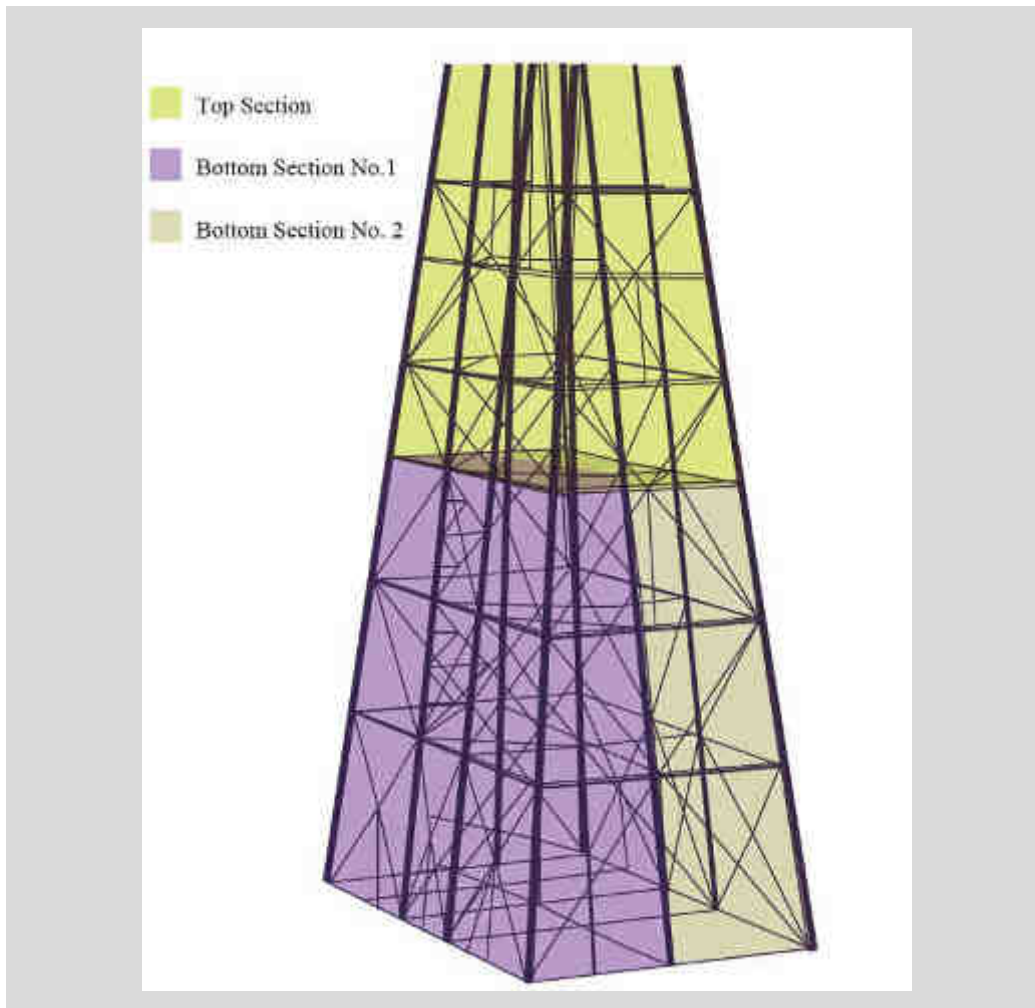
Kinsale Alpha jacket schematic showing possible jacket sections
